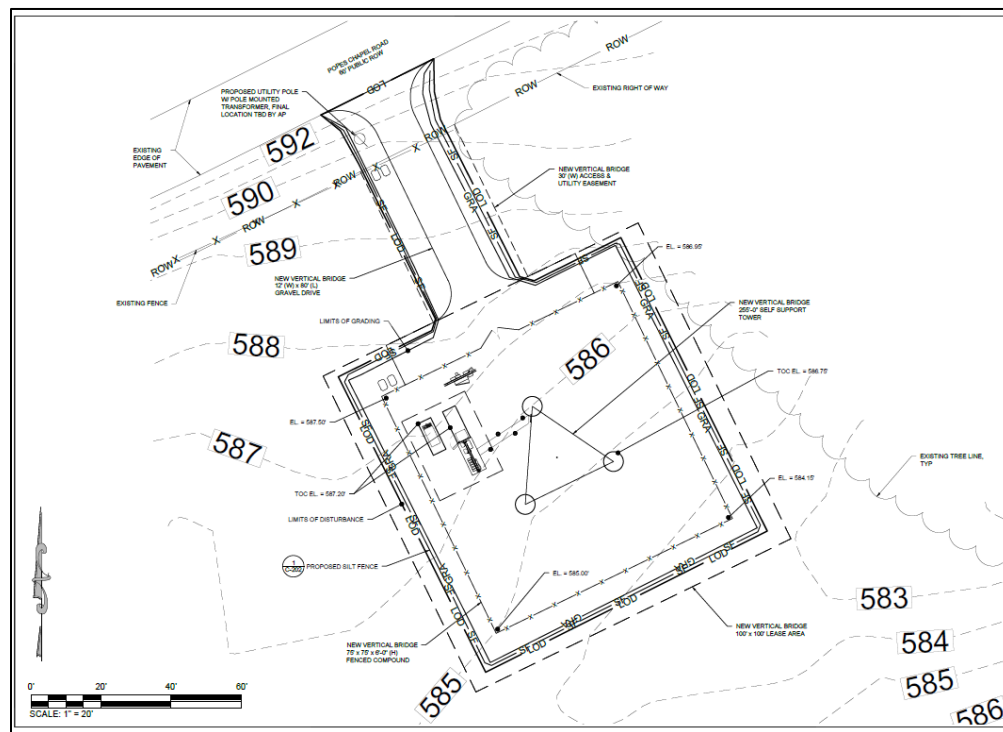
Site Plan with Stormwater and Sediment Controls
